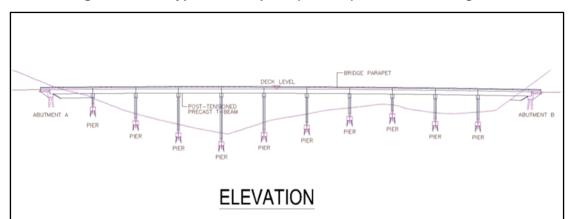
Typical Underpass (Viaduct) Wildlife Crossing in PL-2
